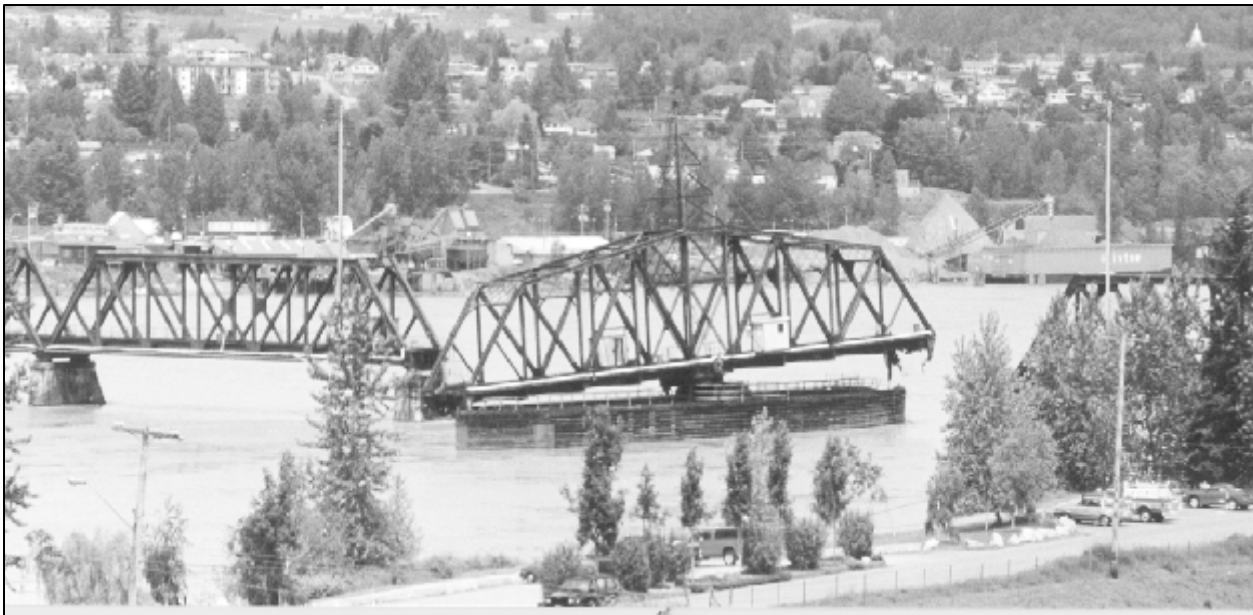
Damaged CPR Mission Railway Bridge at Mission, B.C., viewed from south shore of Fraser River. Meeker Cedar mill in background with a chip barge at loading facility.
